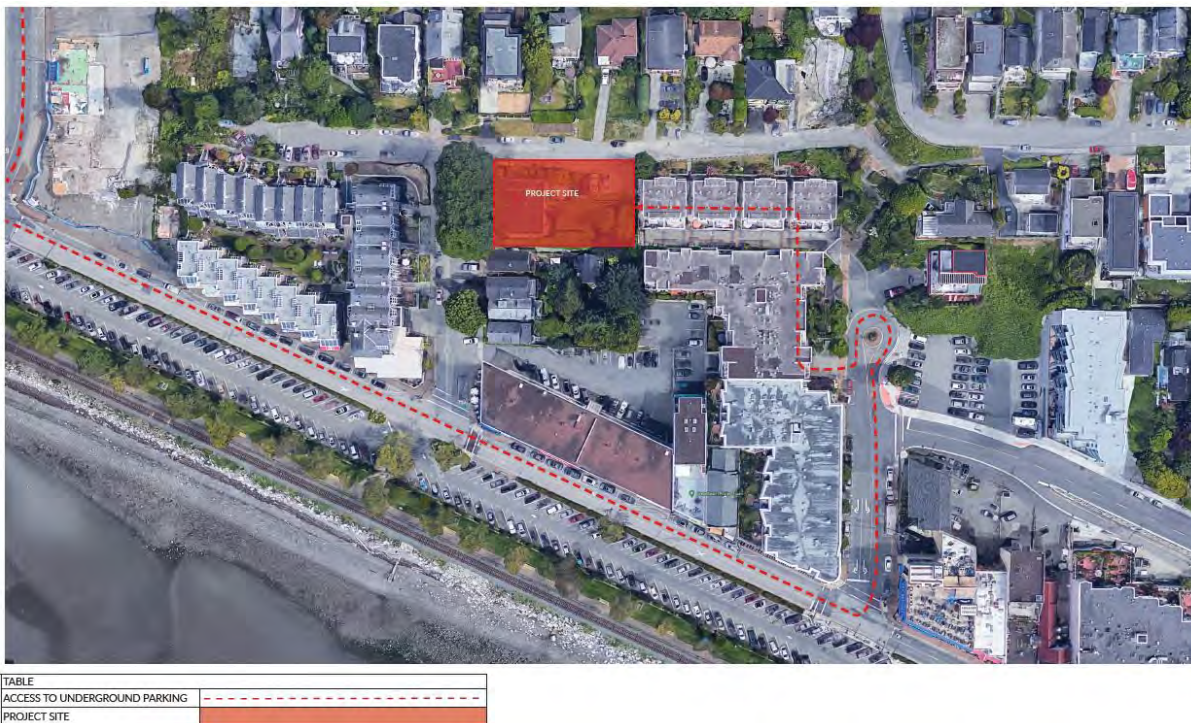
Proposed access through Montecito Parkade to proposed underground parkade
